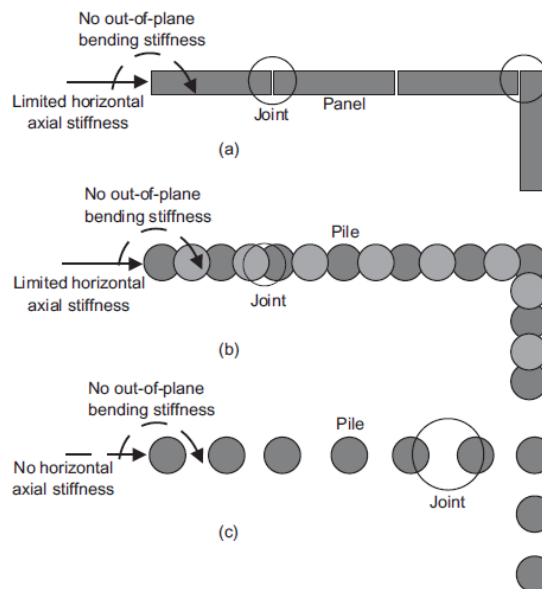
Schematic view of different wall types (a) diaphragm wall (b) secant pile wall (c) contiguous pile wall (Zdravkovic, Potts et al. 2005)
